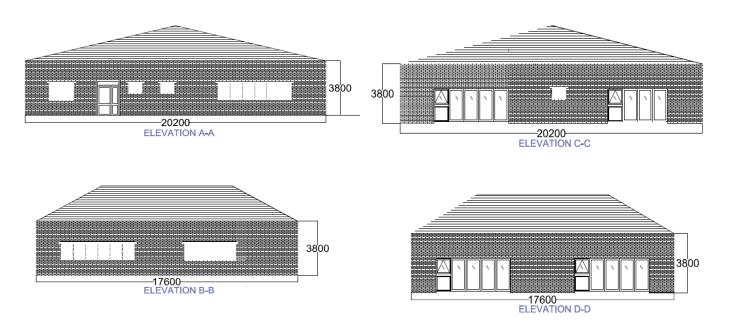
Proposed front (east) and side (south) elevations (left). Proposed rear (west) and side (north) elevations (right).
